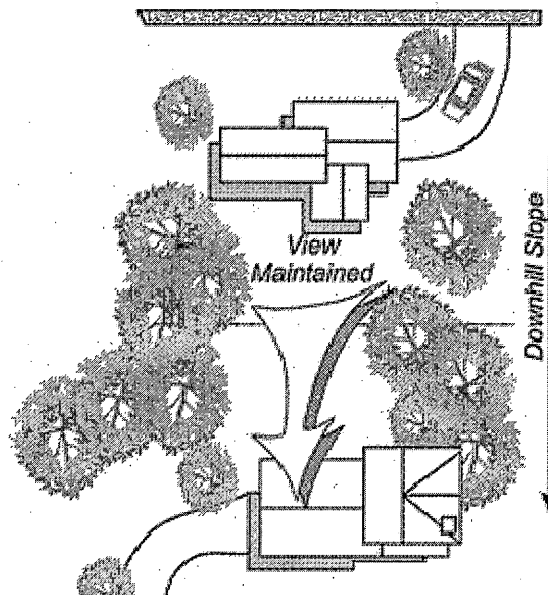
Example of Preferred Location of Second Floor to Preserve Views
